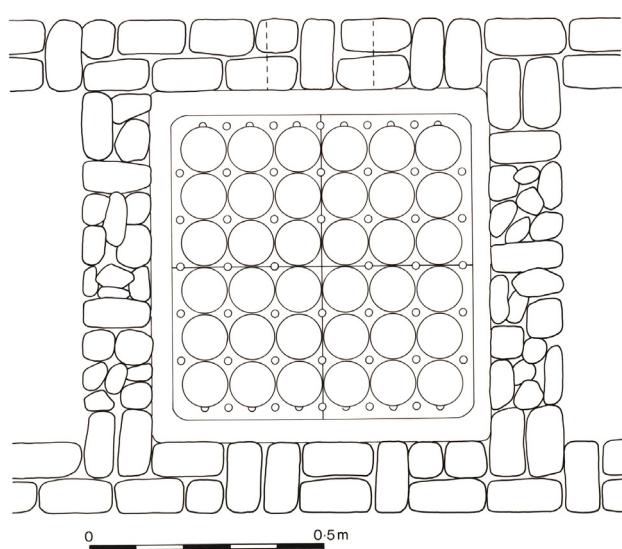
Plan of a typical furnace at the perforated plate level. (B R Craddock)
